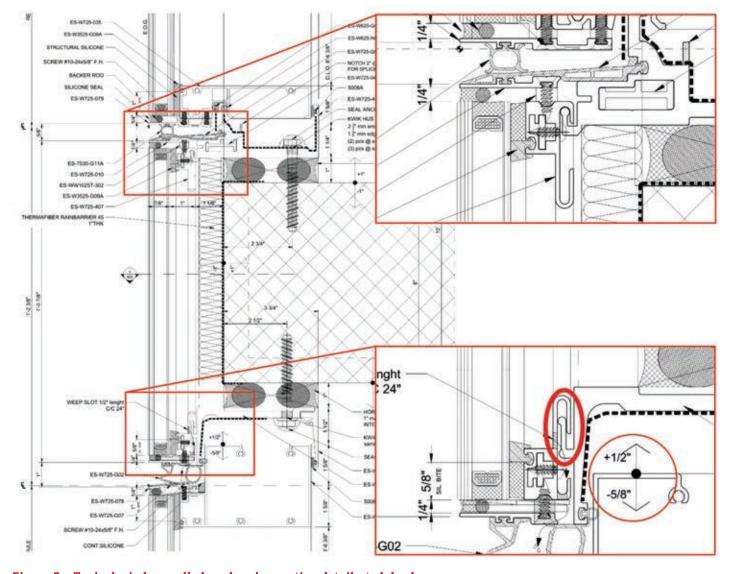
Typical window wall shop drawing section detail at slab edge.
